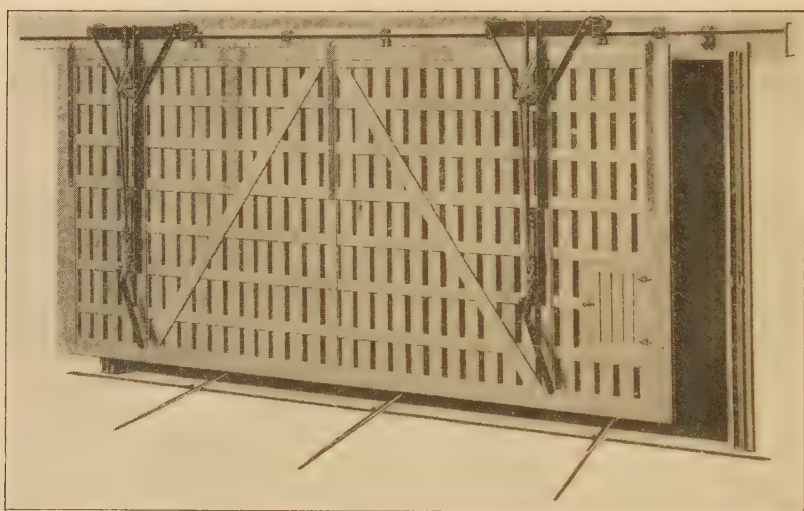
Double dry-kiln door carriers used on wide doors. (Courtesy, Dry Kiln Door Carrier Co.)
